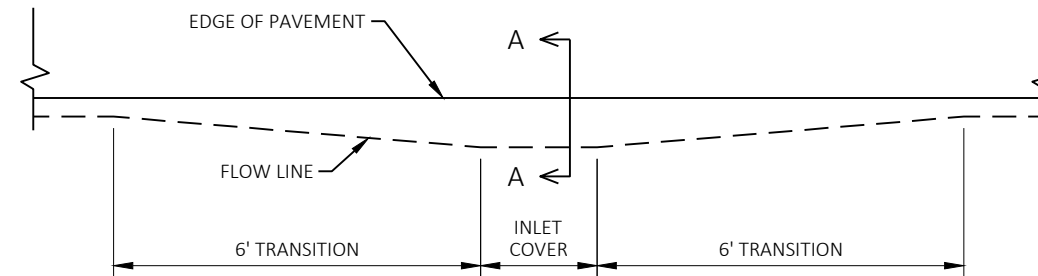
DETAIL OF INLET ADJUSTMENTS AT BARRIER
